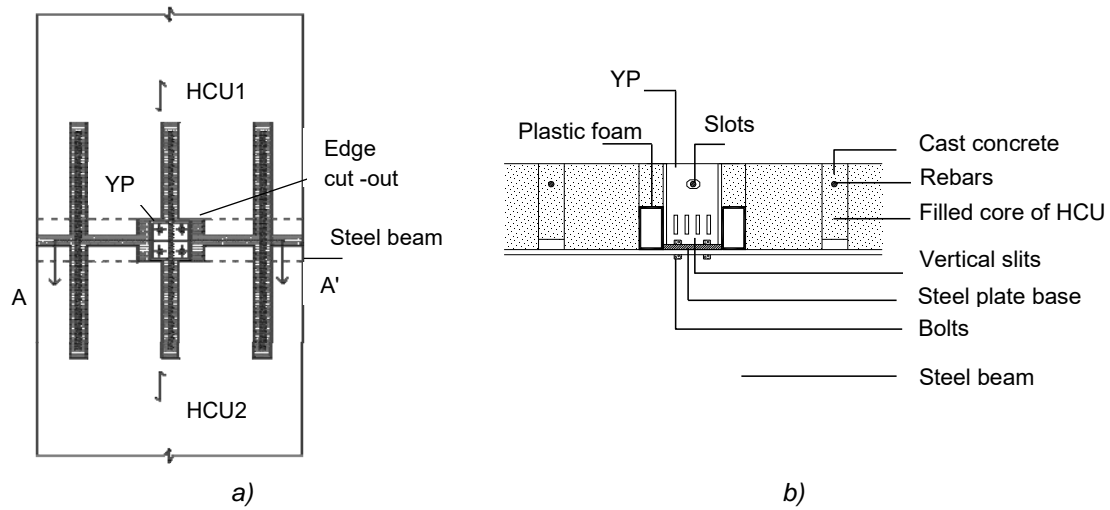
a) Plan view; b) longitudinal section AA' of the proposed connection
